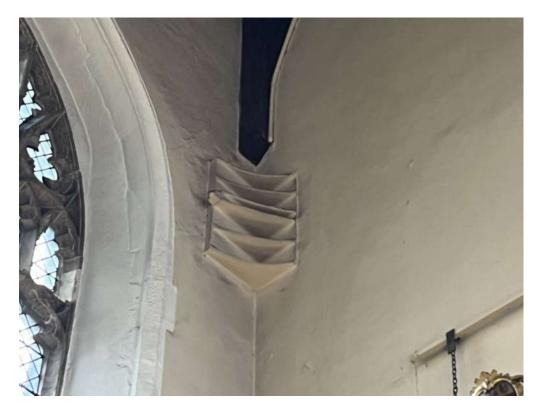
Typical eaves detail (concrete eaves beam/infill present)
